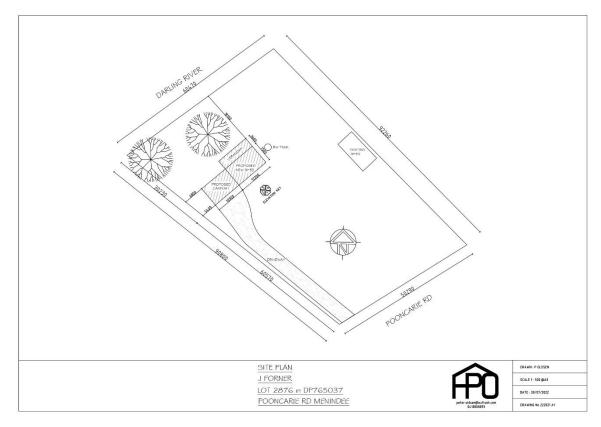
Proposed site plan new shed & verandah & carport J Forner Lot2876 in DP 765037 Pooncarie Road Menindee
